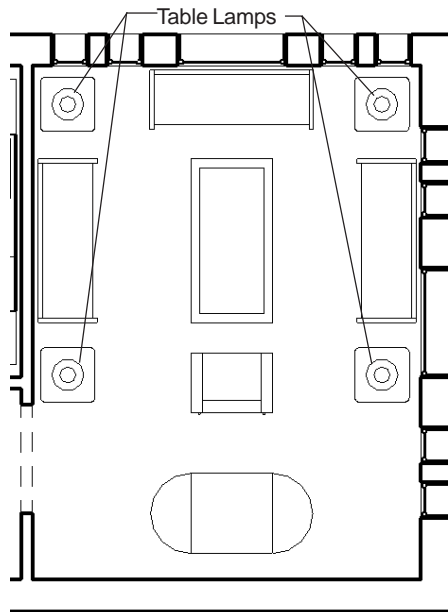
Sketch floor plan for adding table lamps to the living room
